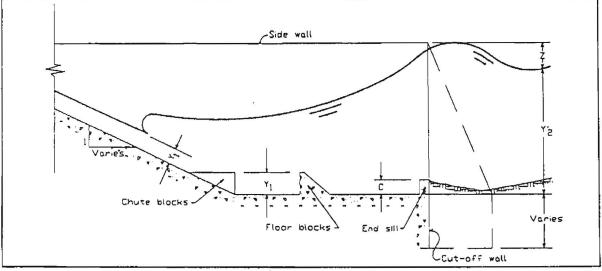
Center-Line Section of Trapezoidal SAF-Type Stilling Basin
